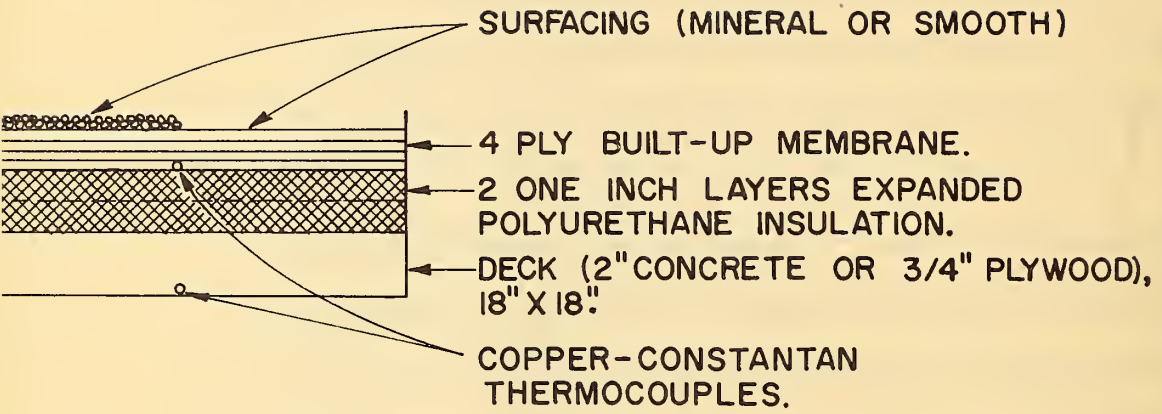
SCHEMATIC DIAGRAM OF TYPICAL BUILT-UP ROOF SPECIMENS EXPOSED OUTDOORS.
